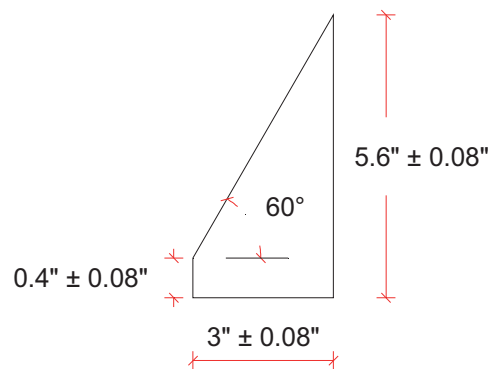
Portland-Cement Concrete Section Dimensions (ASTM C882)
